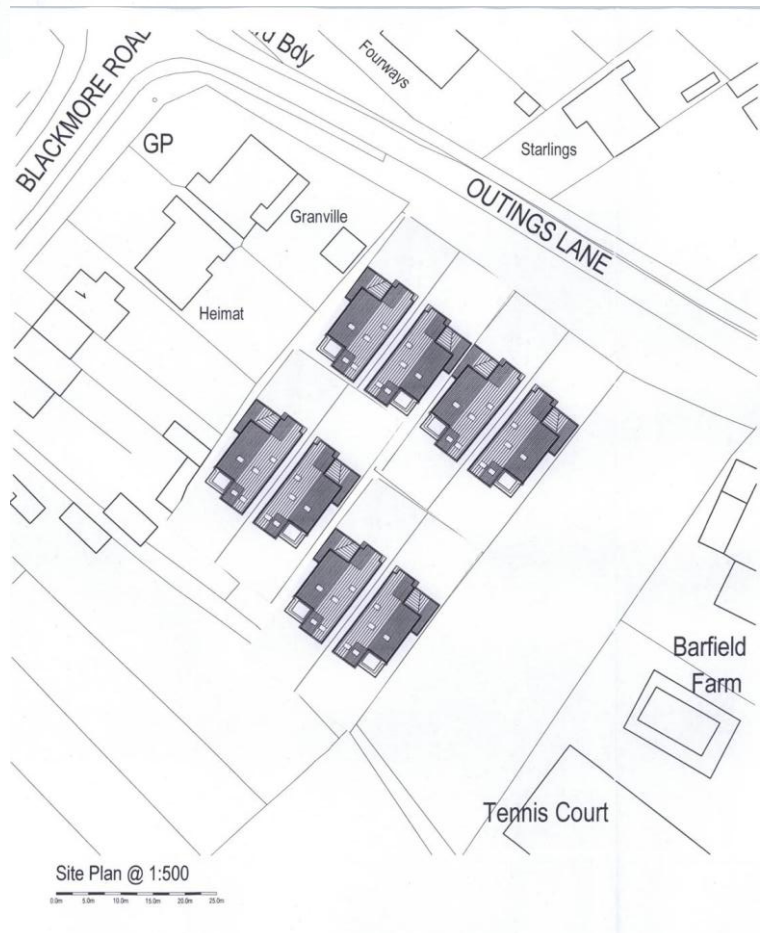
suggested placement of 7 properties although with concerns over garden and parking facilities
